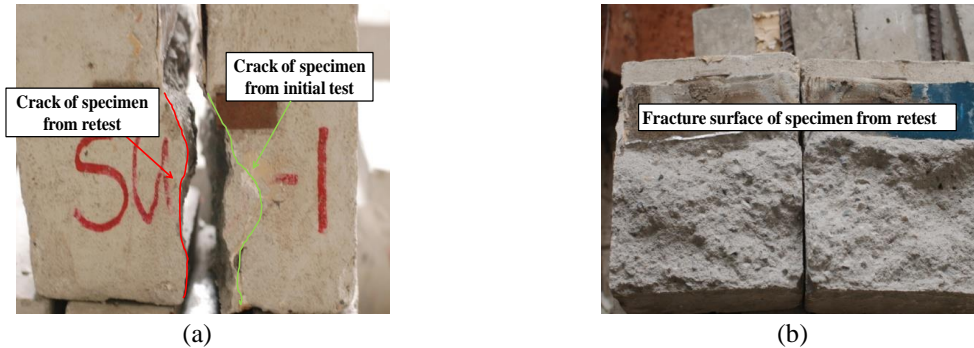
Fracture locations of specimens in initial test and re-testing: (a) cracks location of specimen, (b) fractural surface of specimen
